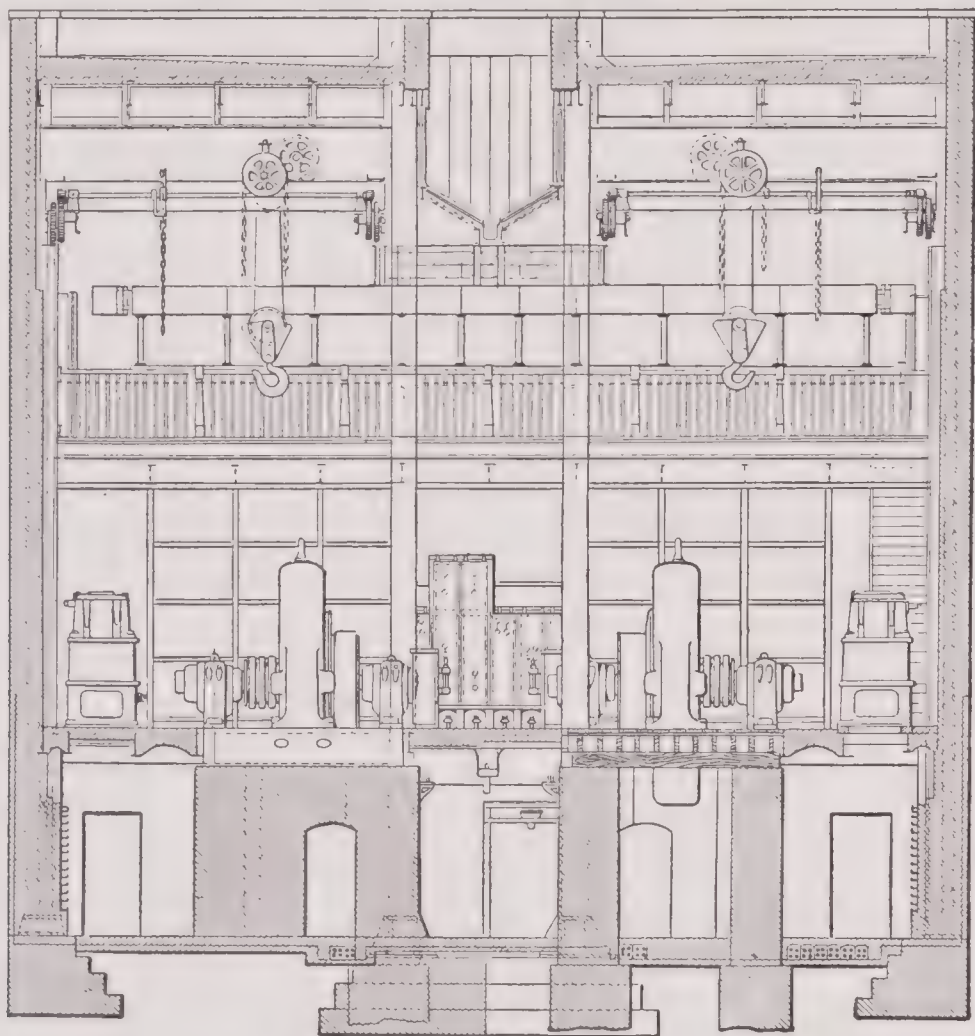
NEW YORK SUBWAY: CROSS-SECTION OF SUB-STATION No. 14.
